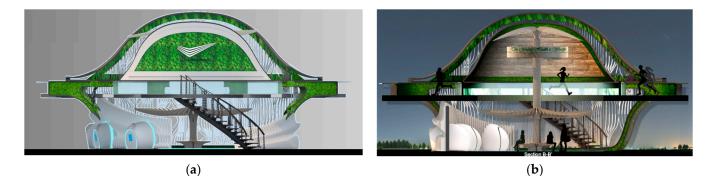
(a) Right side elevation; (b) right side section (designed by the authors).
